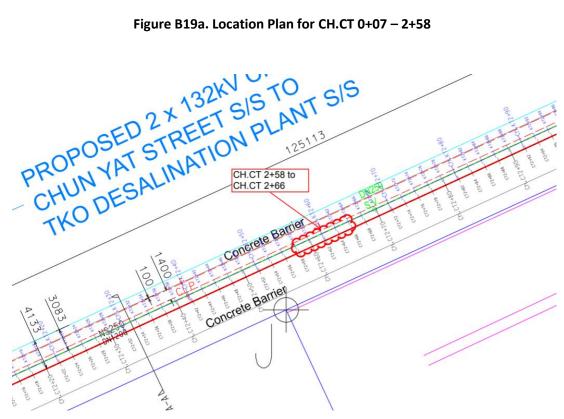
Location Plan for CH.CT 2+58 - 2+66
